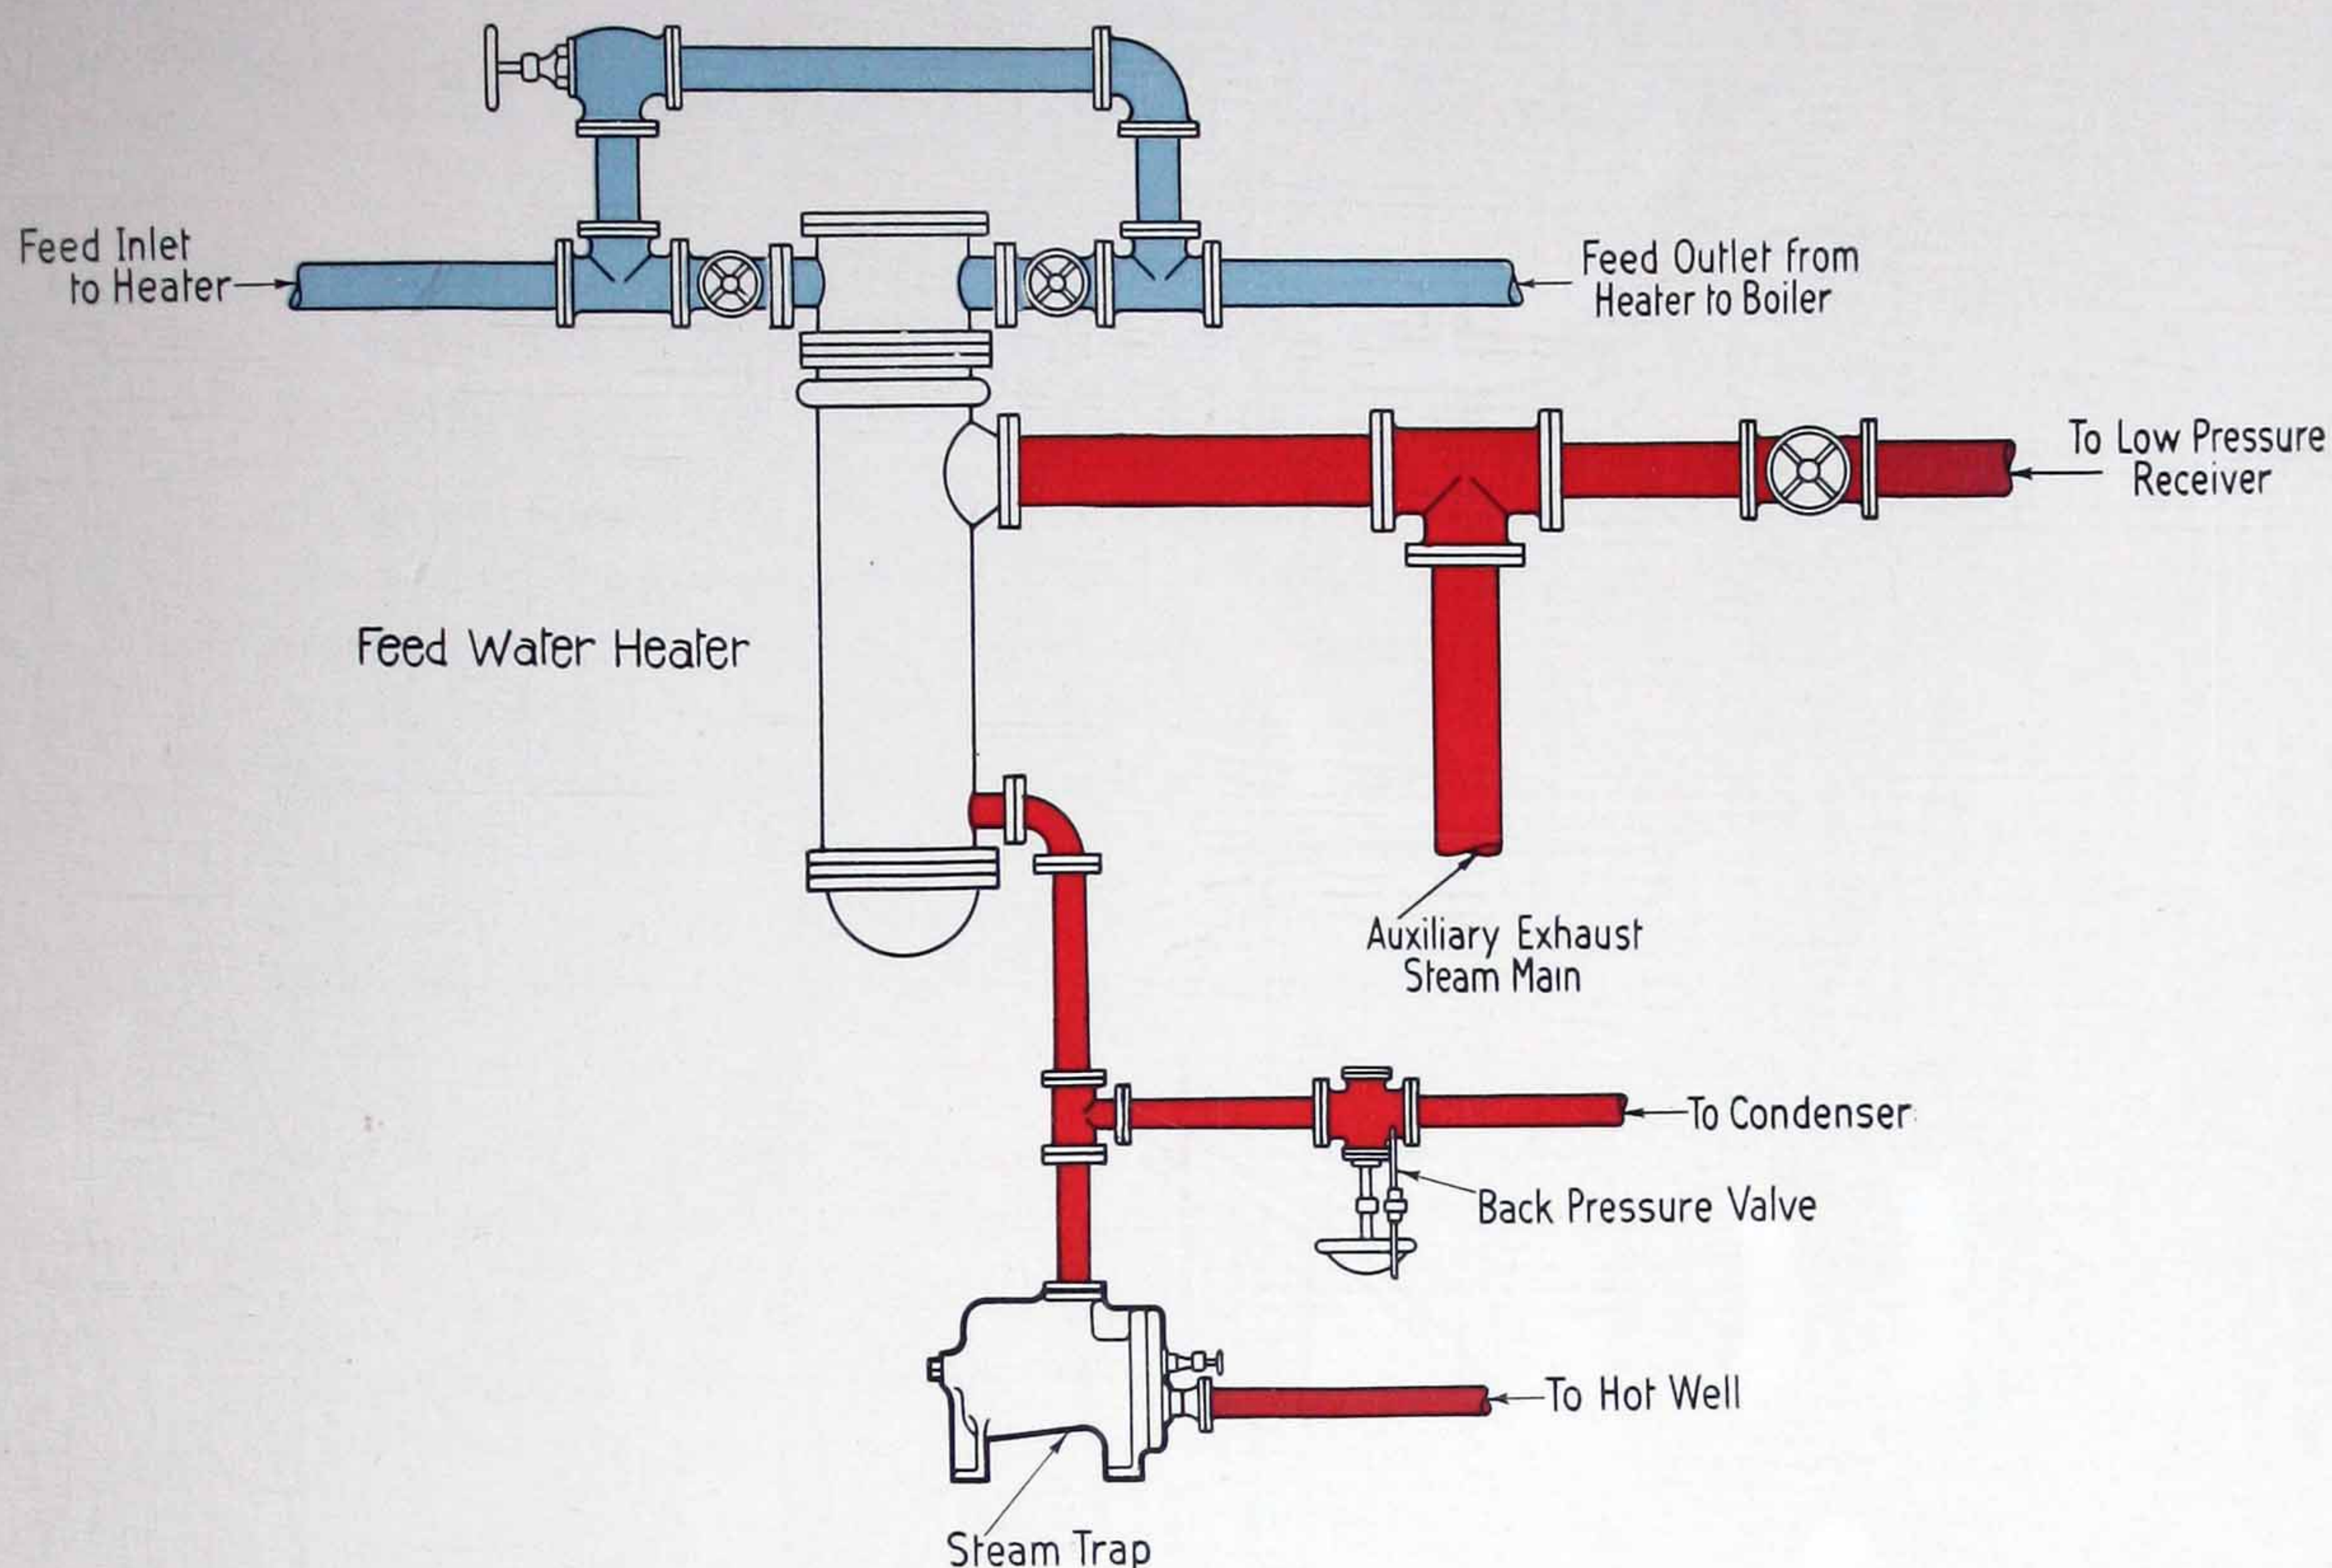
C. ARRANGEMENT OF BOILER FEED WATER HEATER INSTALLATION. Red is used for exhaust steam, blue for water
